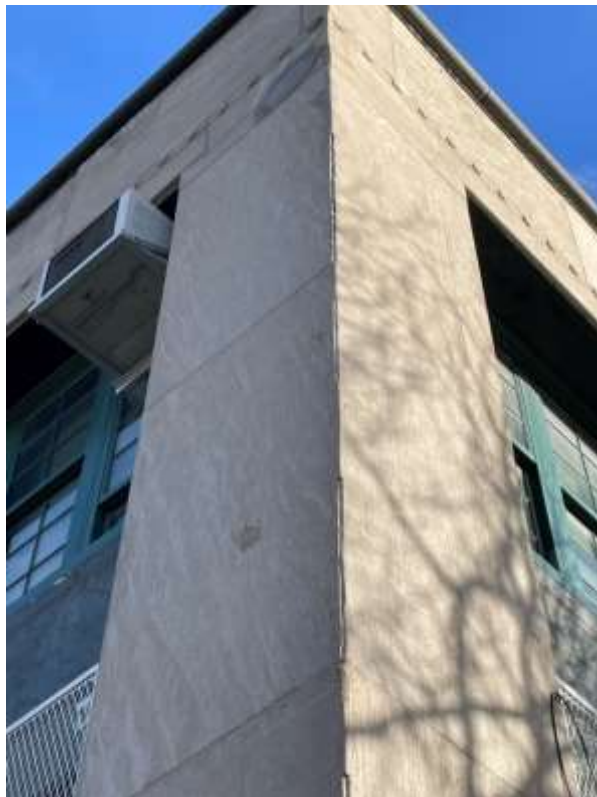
Deteriorated joint grout at upper area at Southwest corner.
